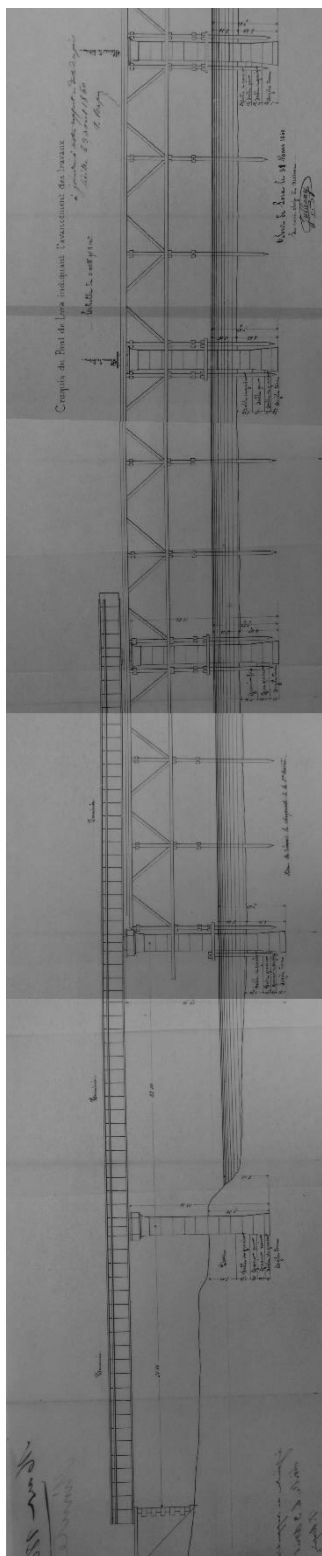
Lora del Rio bridge. Site plan showing the state of the works in April 1860 (detail). Archivo Histórico Ferroviario (Spanish National Railway Archive, Madrid).
